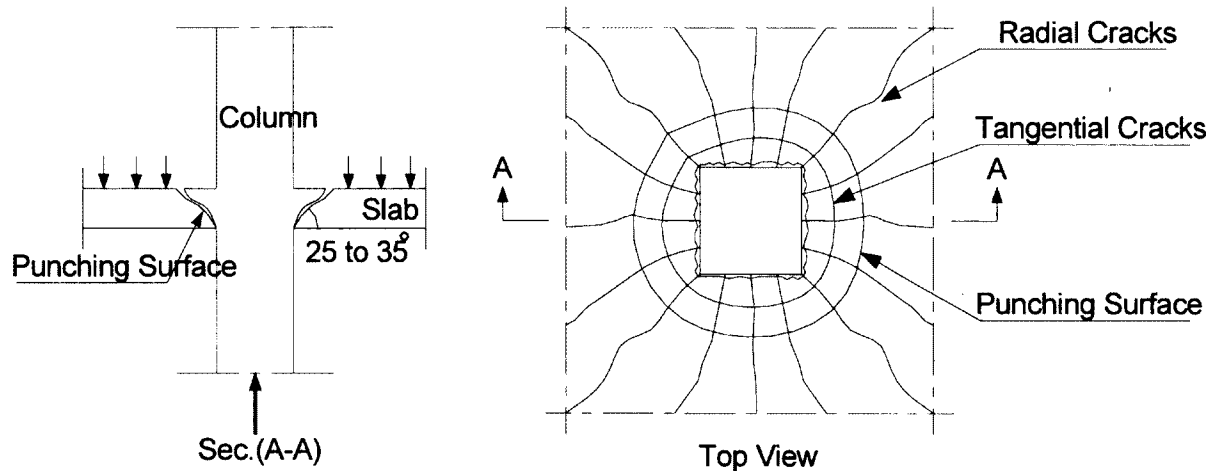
Typical symmetrical punching failure around an interior column (Sherif 1996)
